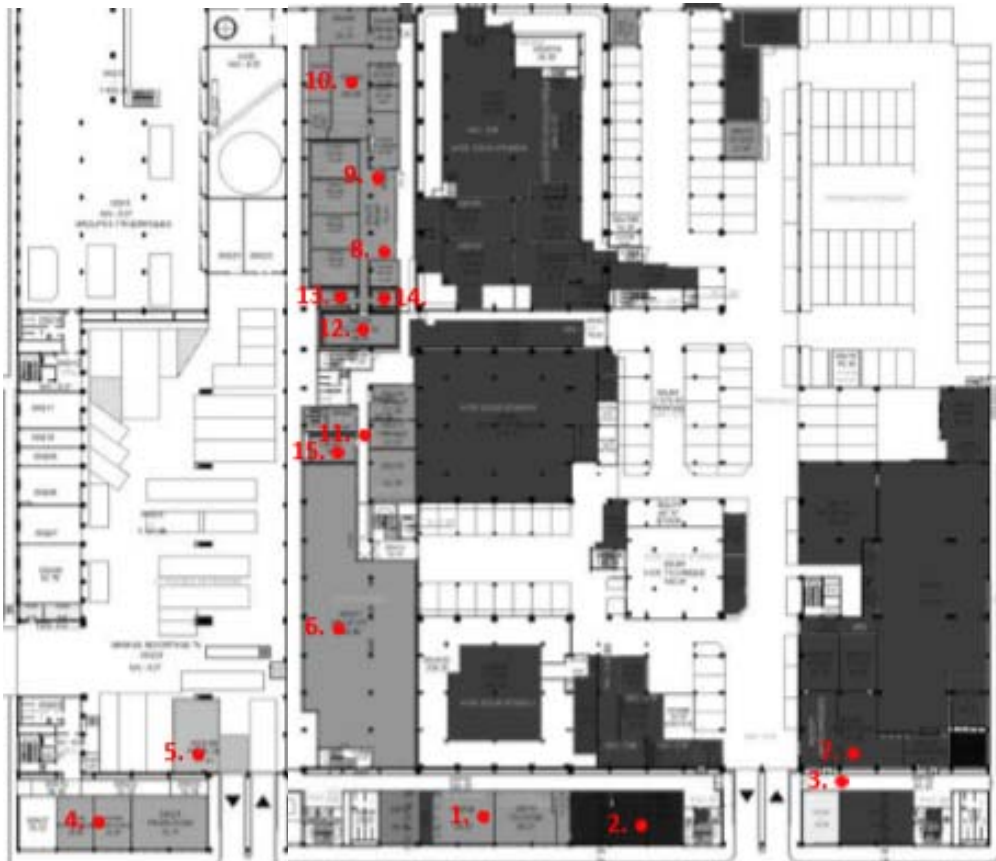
Placement Access Points for Ground Floor in Building CHJM
